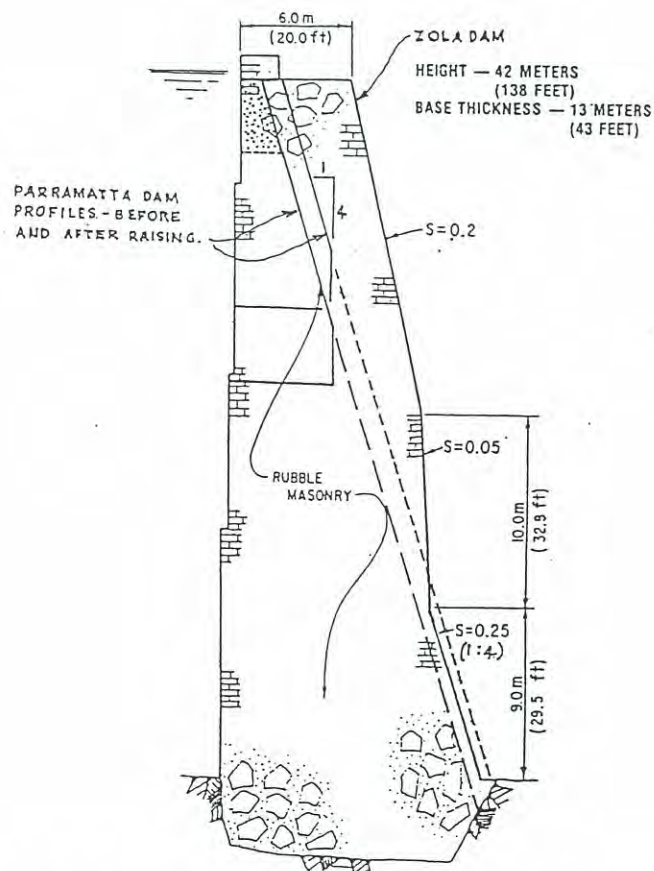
Zola Dam section, with Parramatta Dam section superimposed.
